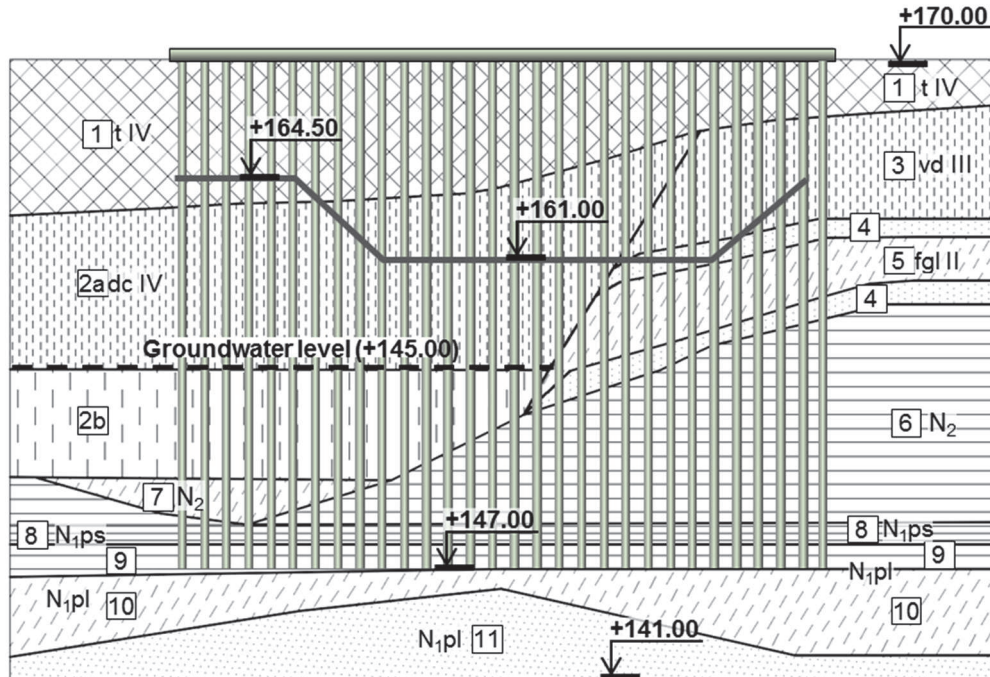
The retaining pile wall on engineer geological profile. Example 2
